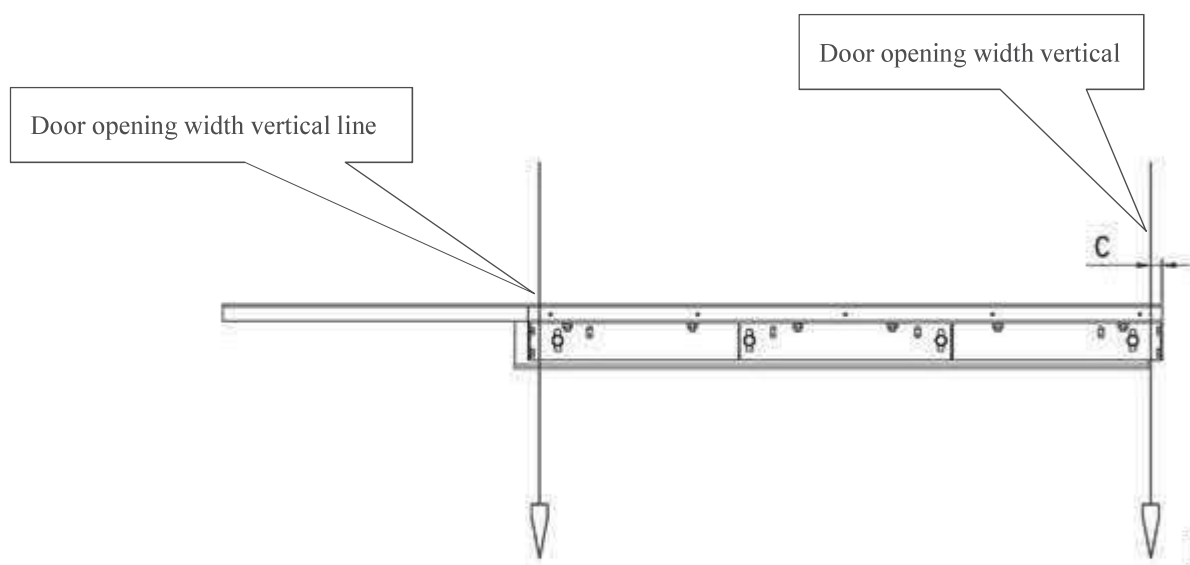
Adjust left and right position of car door sill (2 Panels side opening).
